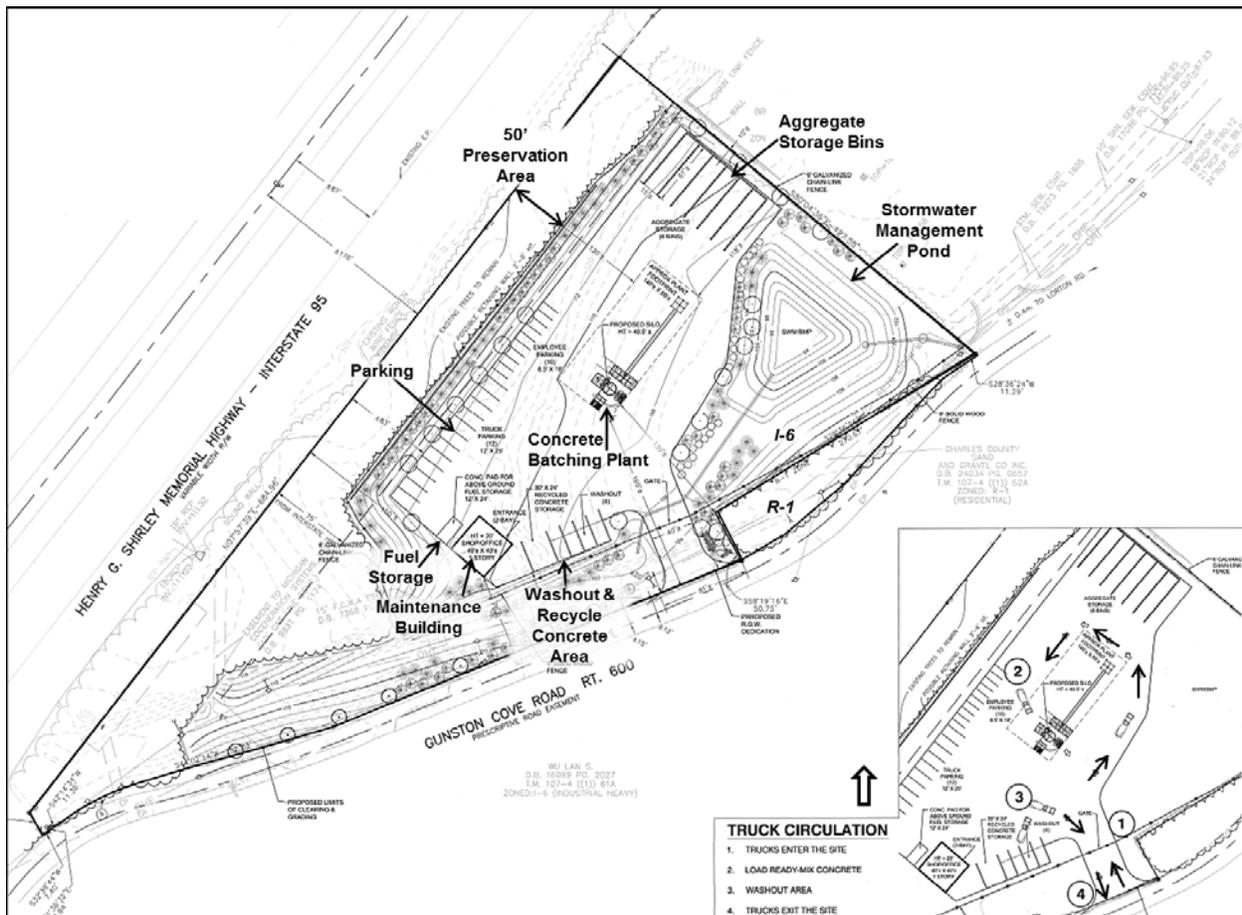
Site Layout, Source: SE Plat, Sheet 3
